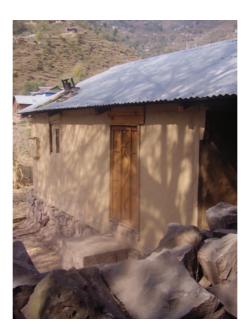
Another single storey house in Muzaffarabad. Source : S. Abidi
